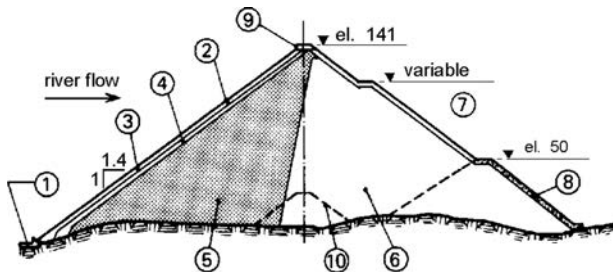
Xingo dam cross-section. (1) Concrete plinth; (2) face slab; (3) zone I; (4) zone II; (5) rockfill zone III; (6) rockfill zone IV; (7) zone V; (8) roller compacted concrete; (9) parapet; (10) central cofferdam.
